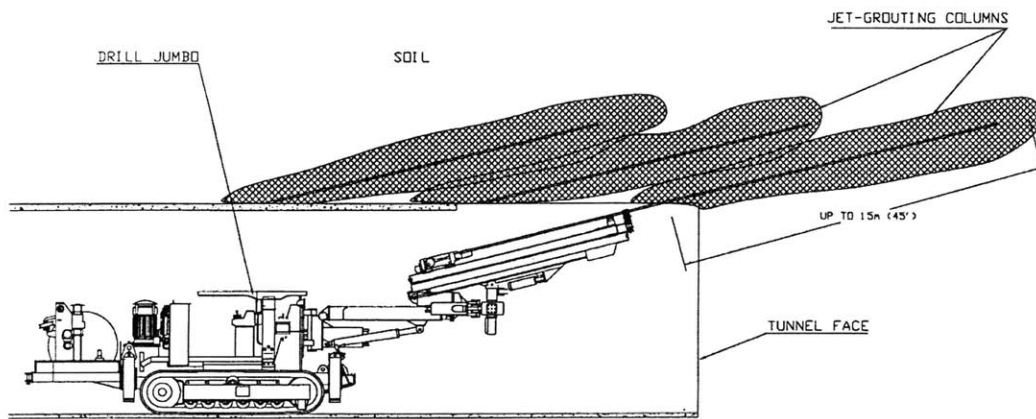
Application of Jet Grouting for Tunnel Construction (Henn 1996)
